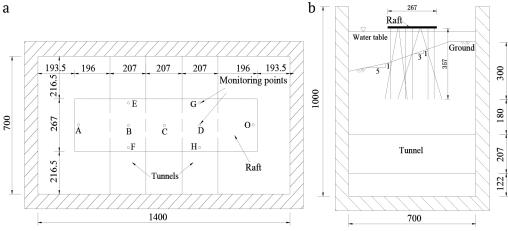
Centrifuge model: a) plan view and b) elevation view (units: mm).
